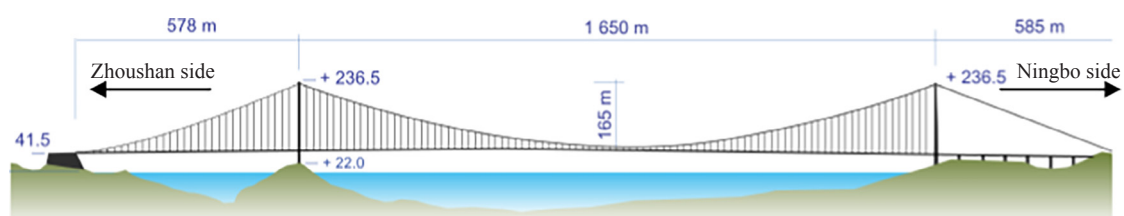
Layout of Xihoumen suspension Bridge (unit: m).
